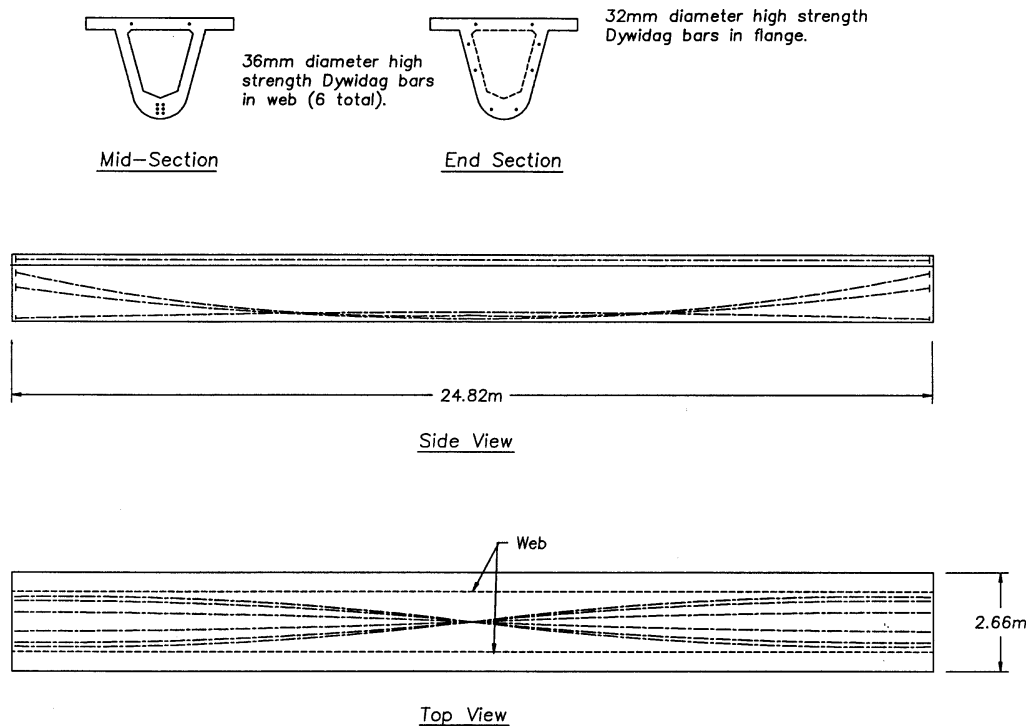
Post-tensioned steel arrangements in the TR07 girder.
